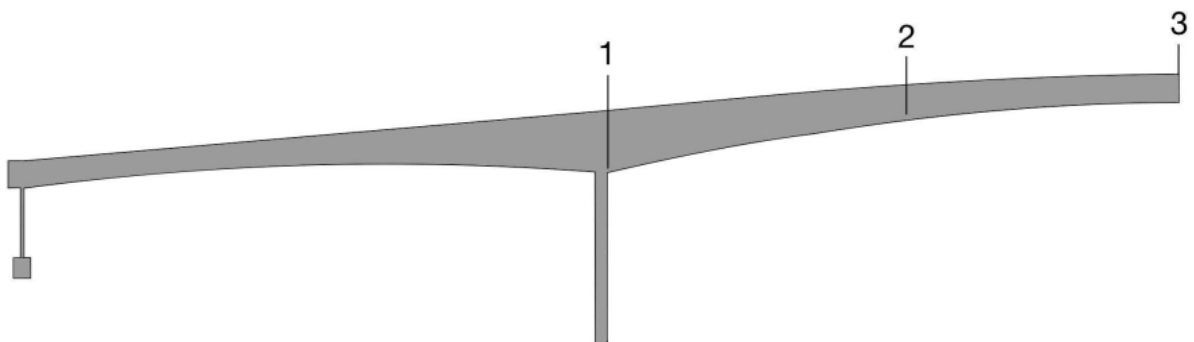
Schematic representation of half Herøysund Bridge indicating the 3 cross-sections studied in this work (Source: [1])
